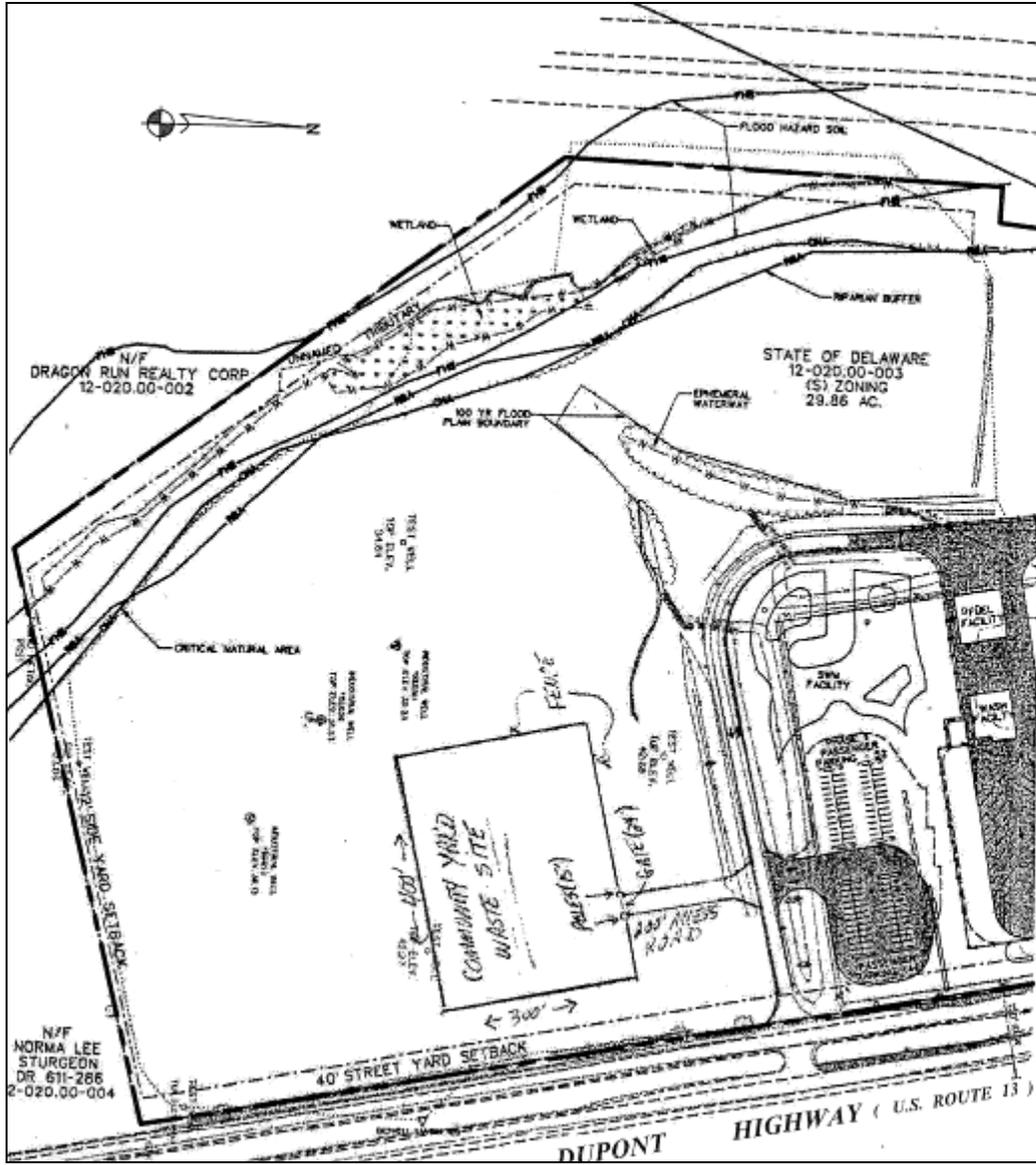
Plat of Proposed Community Yard Waste Site in Project Area in 2007. (New Castle County Board of Adjustment 2007)
